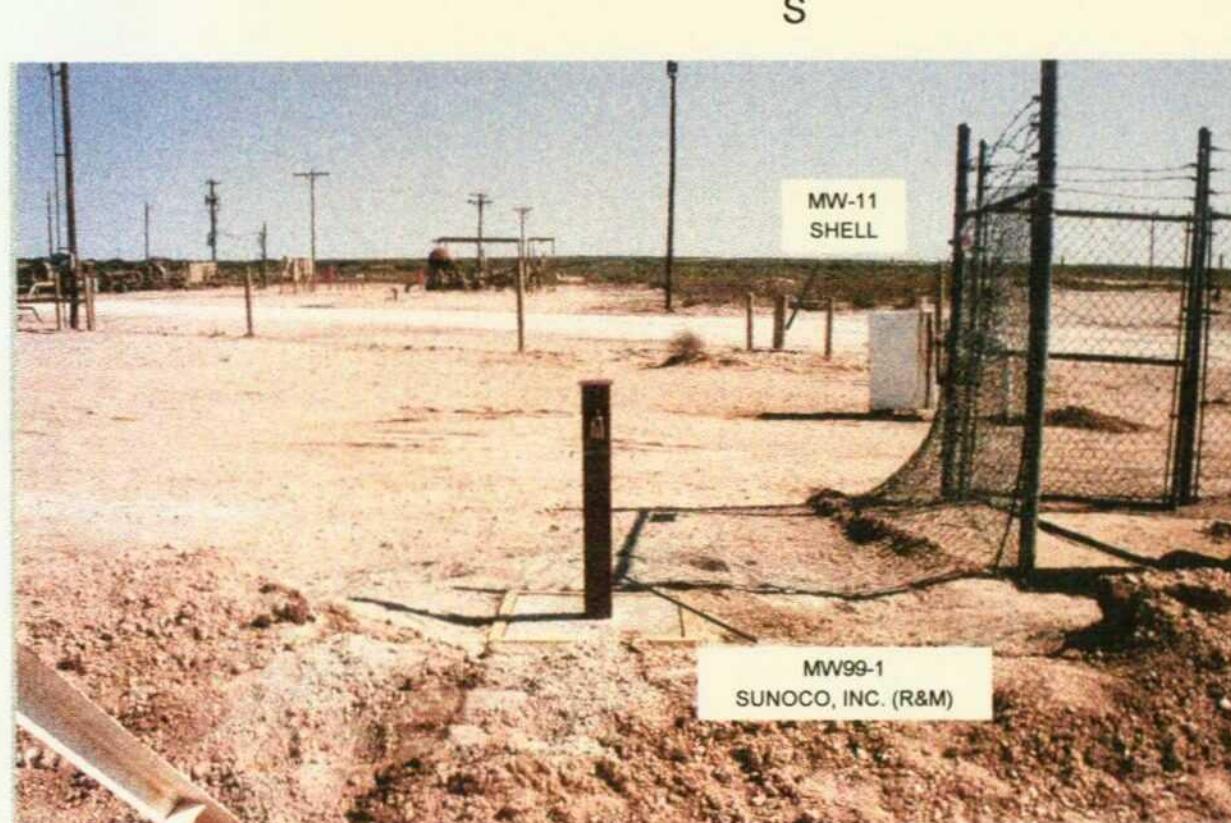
B - MW99-1 SHOWING TYPICAL WELL CONSTRUCTION
